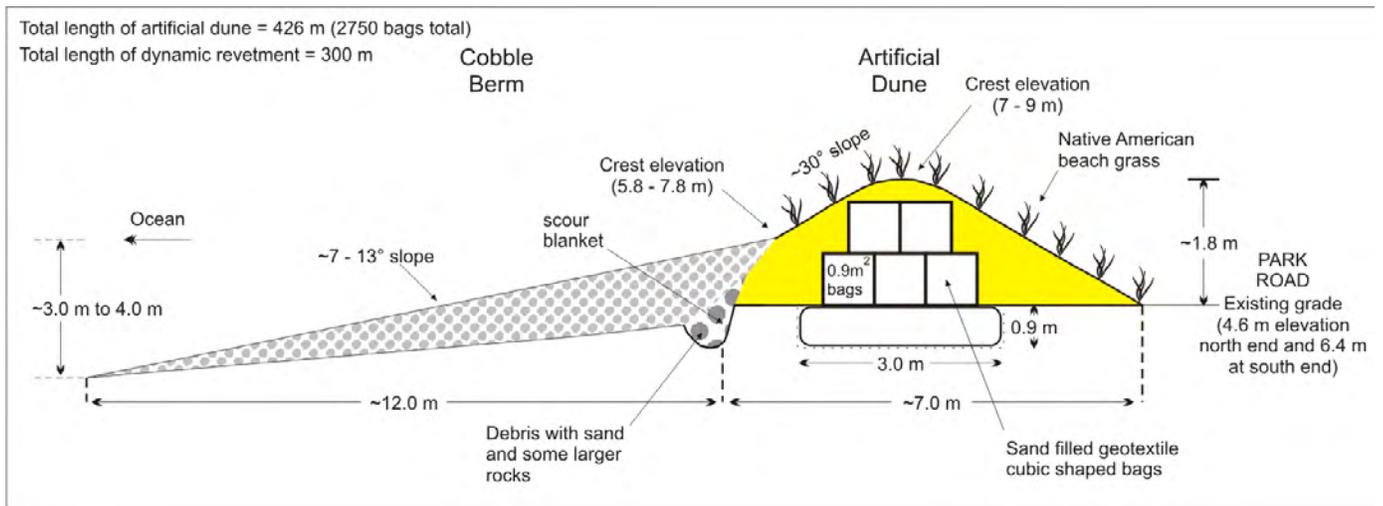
Design for the cobble berm and reinforced foredune to protect Cape Lookout State Park from erosion and flooding. The elevations are referenced to the NAVD 88 datum.
